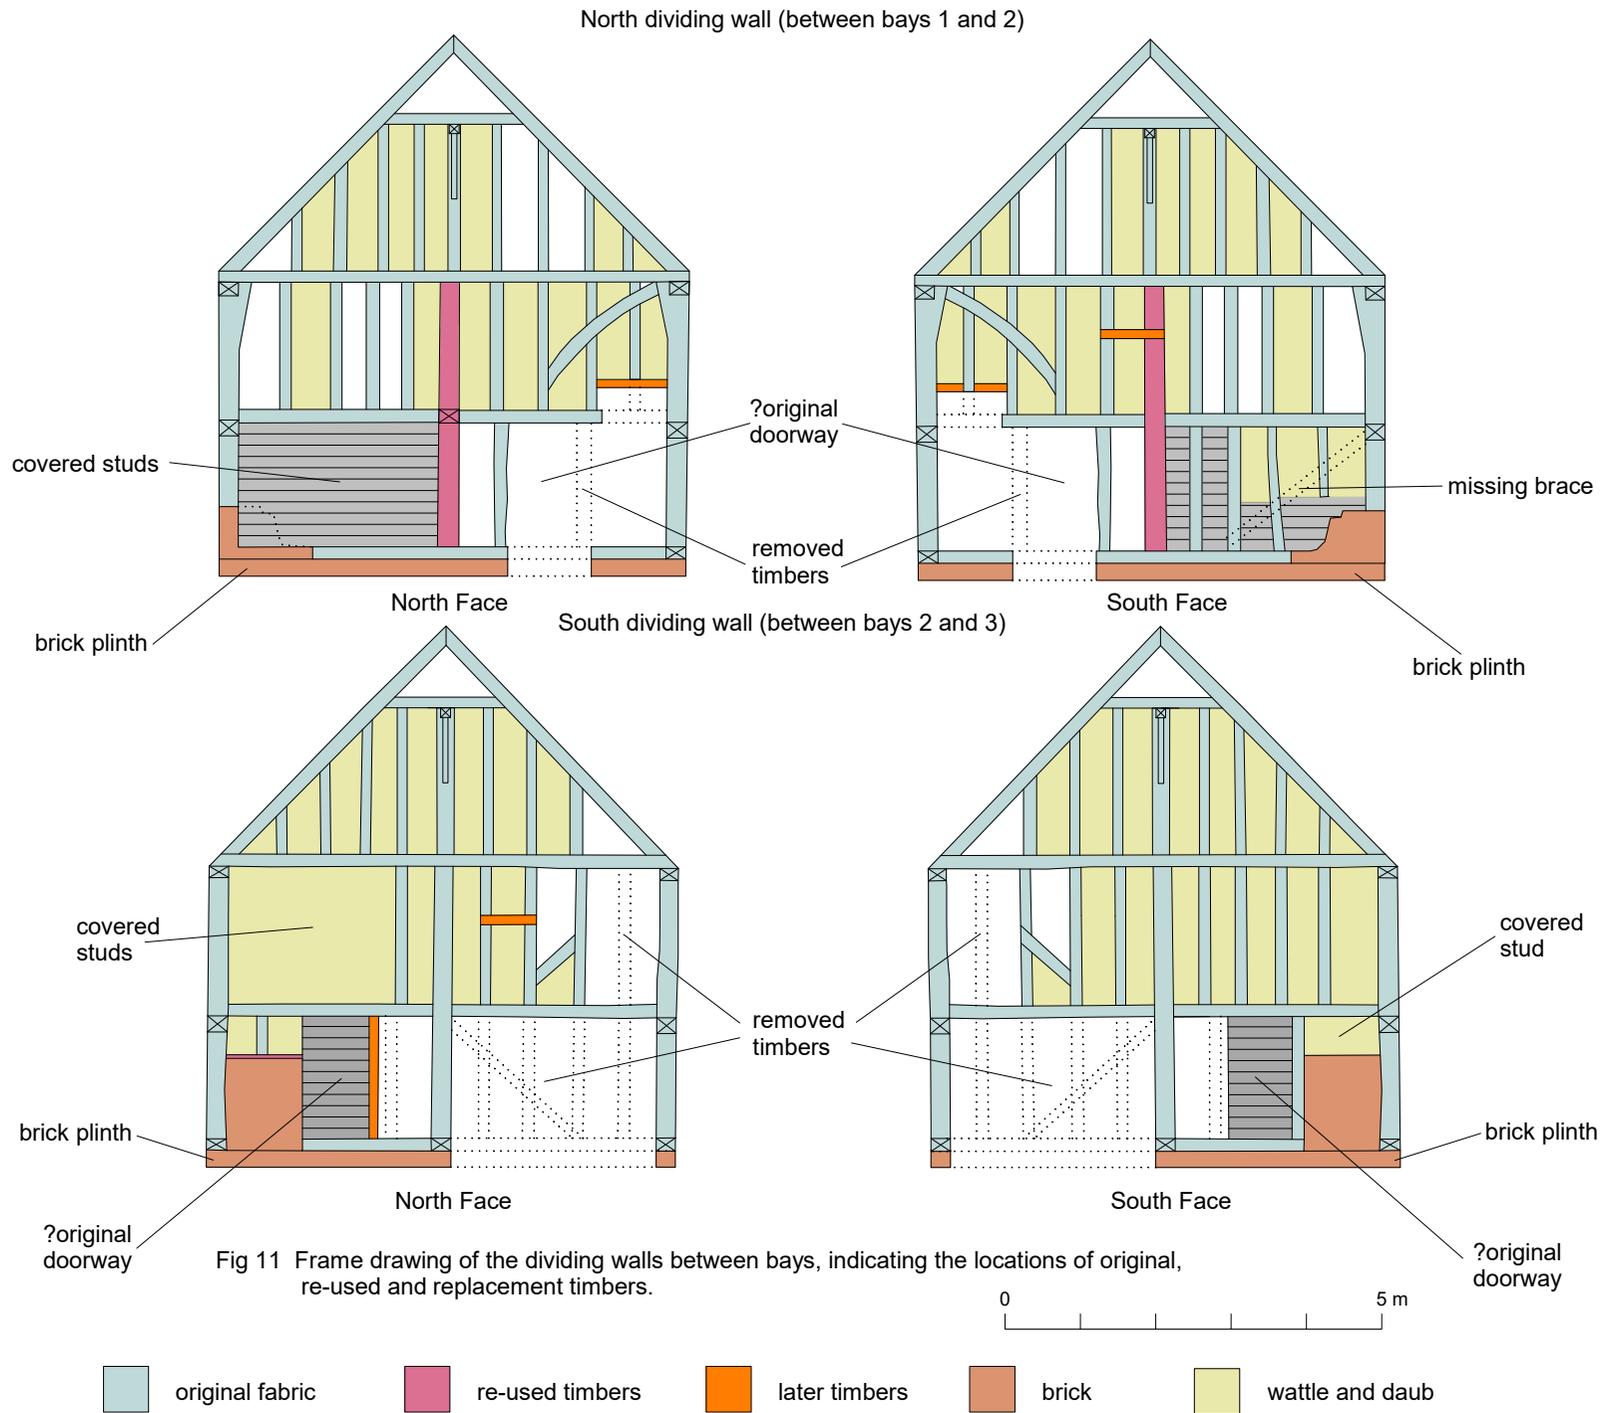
Frame drawing of the dividing walls between bays, indicating the locations of original, re-used and replacement timbers.
